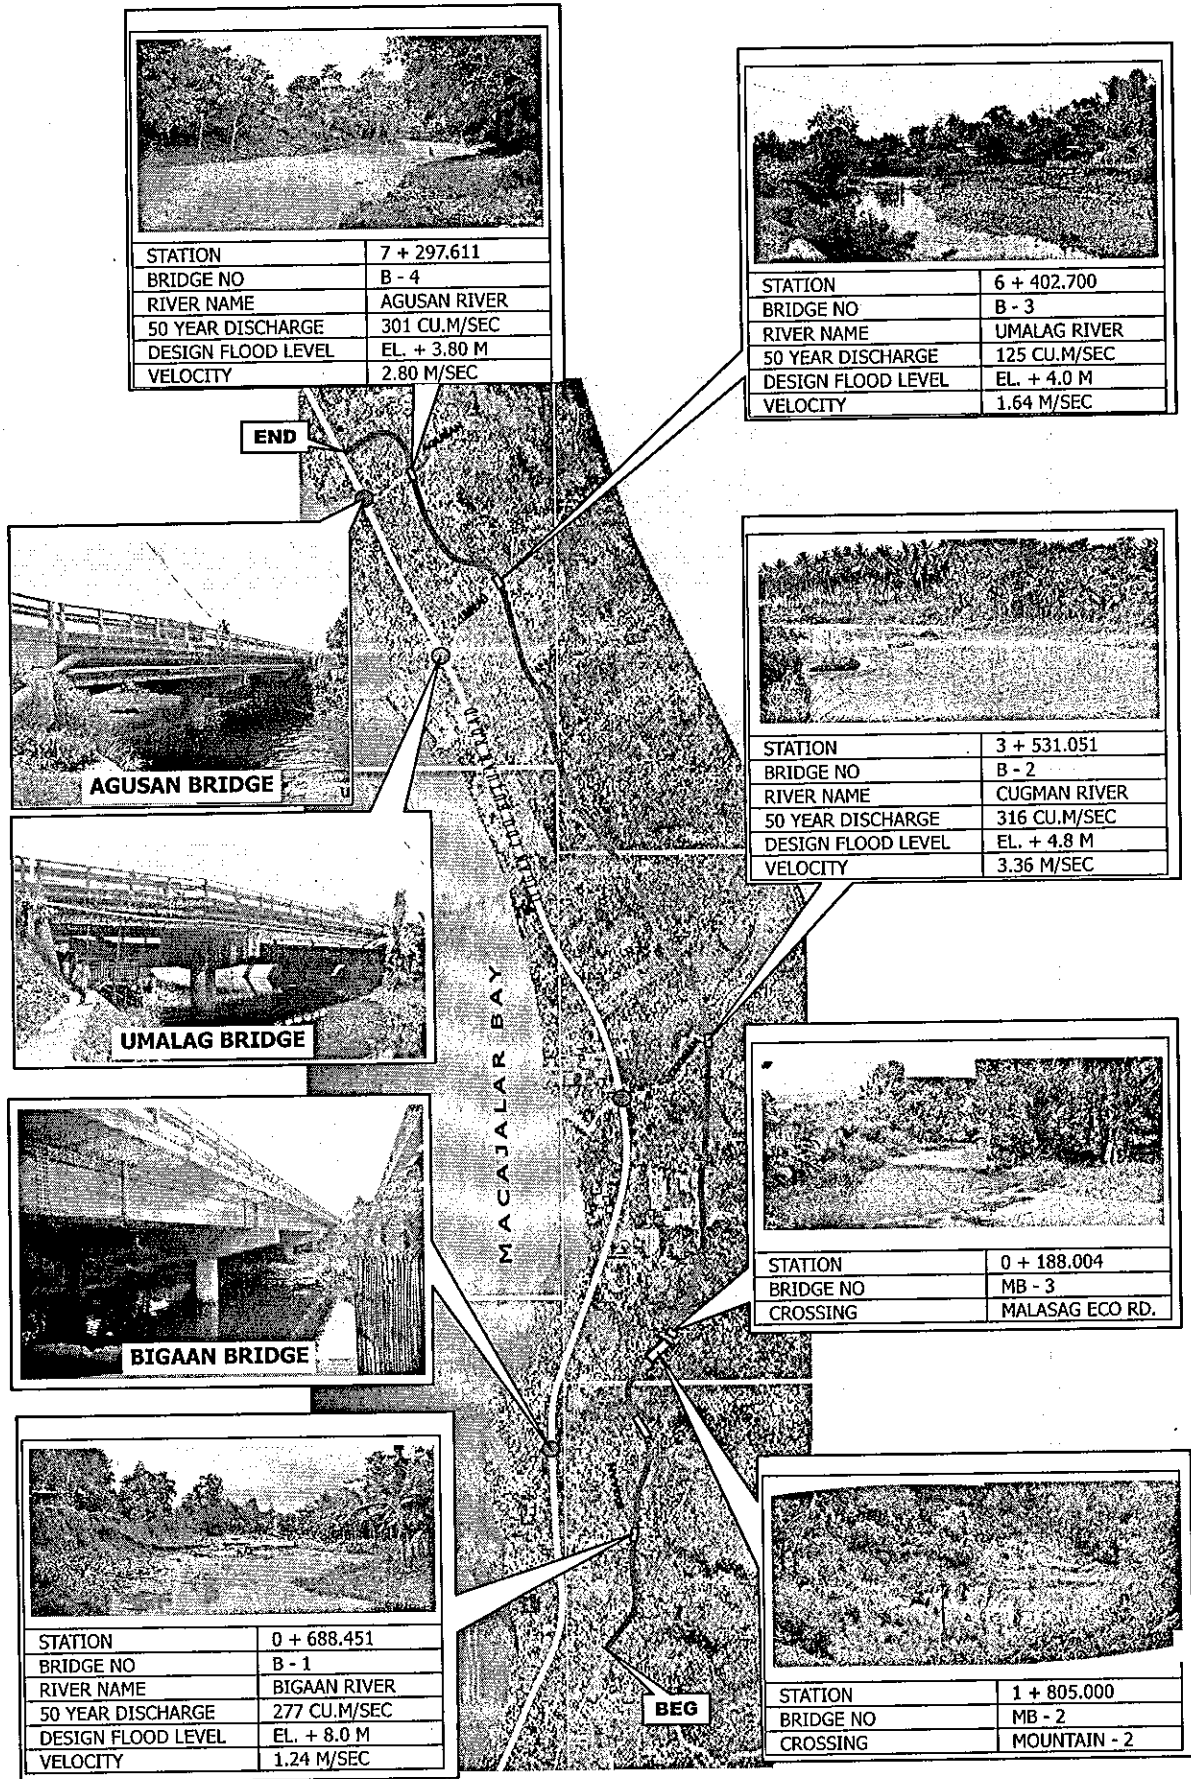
RIVER CONDITION AT PROPOSED BRIDGE SITE
